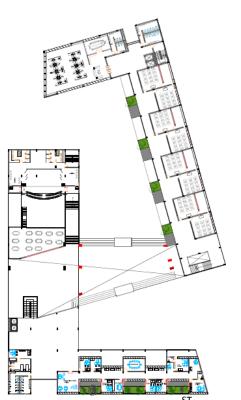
FINAL DESIGN 1<sup>ST</sup> FLOOR PLAN
